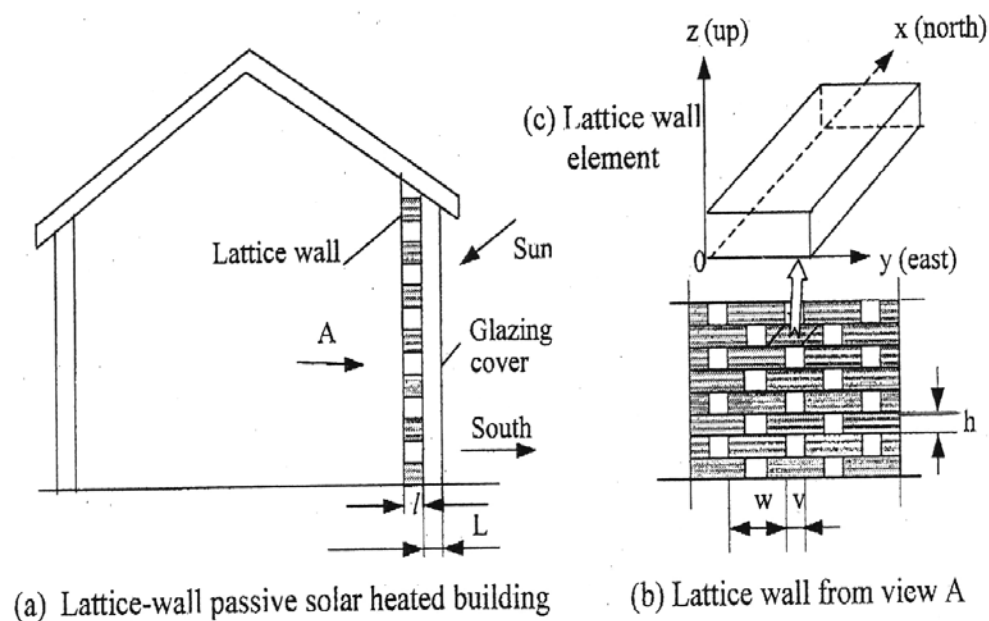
2. Lattice wall and lattice-wall passive solar heated building
